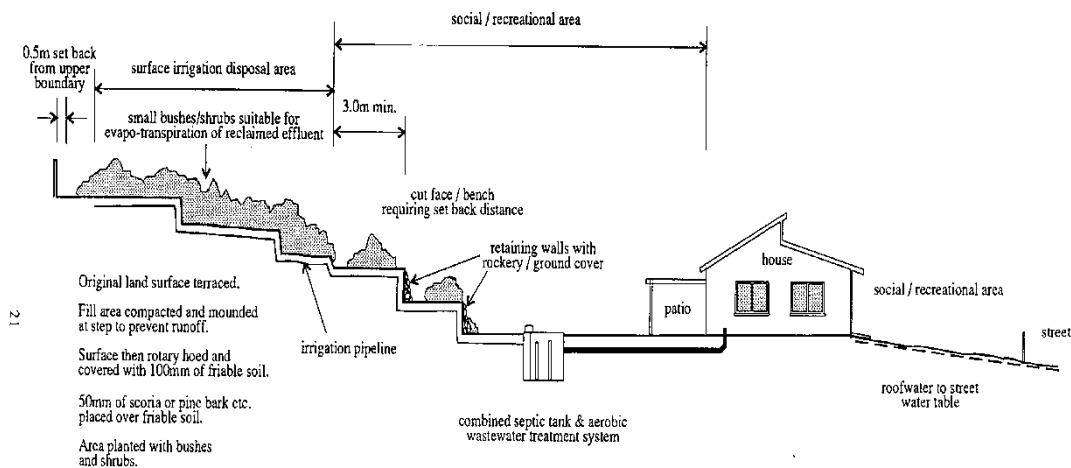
TYPICAL SECTION THROUGH CUT / BENCHED SITE
